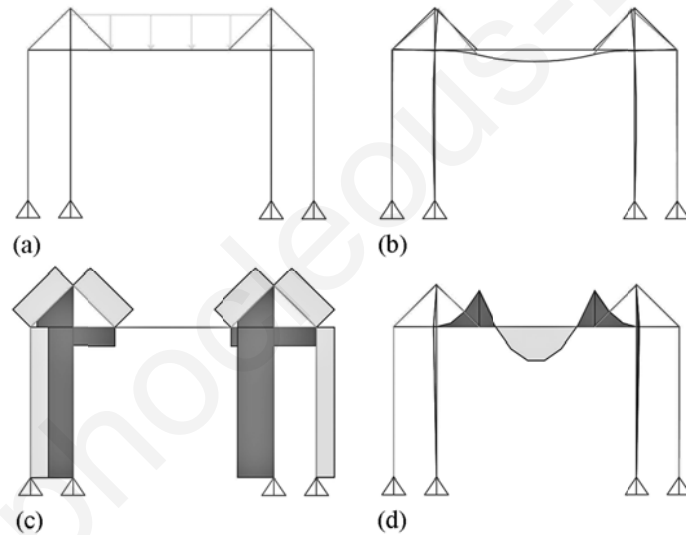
System with stayed cables: (a) model; (b) deformed shape; (c) axial forces; (d) bending moments.
